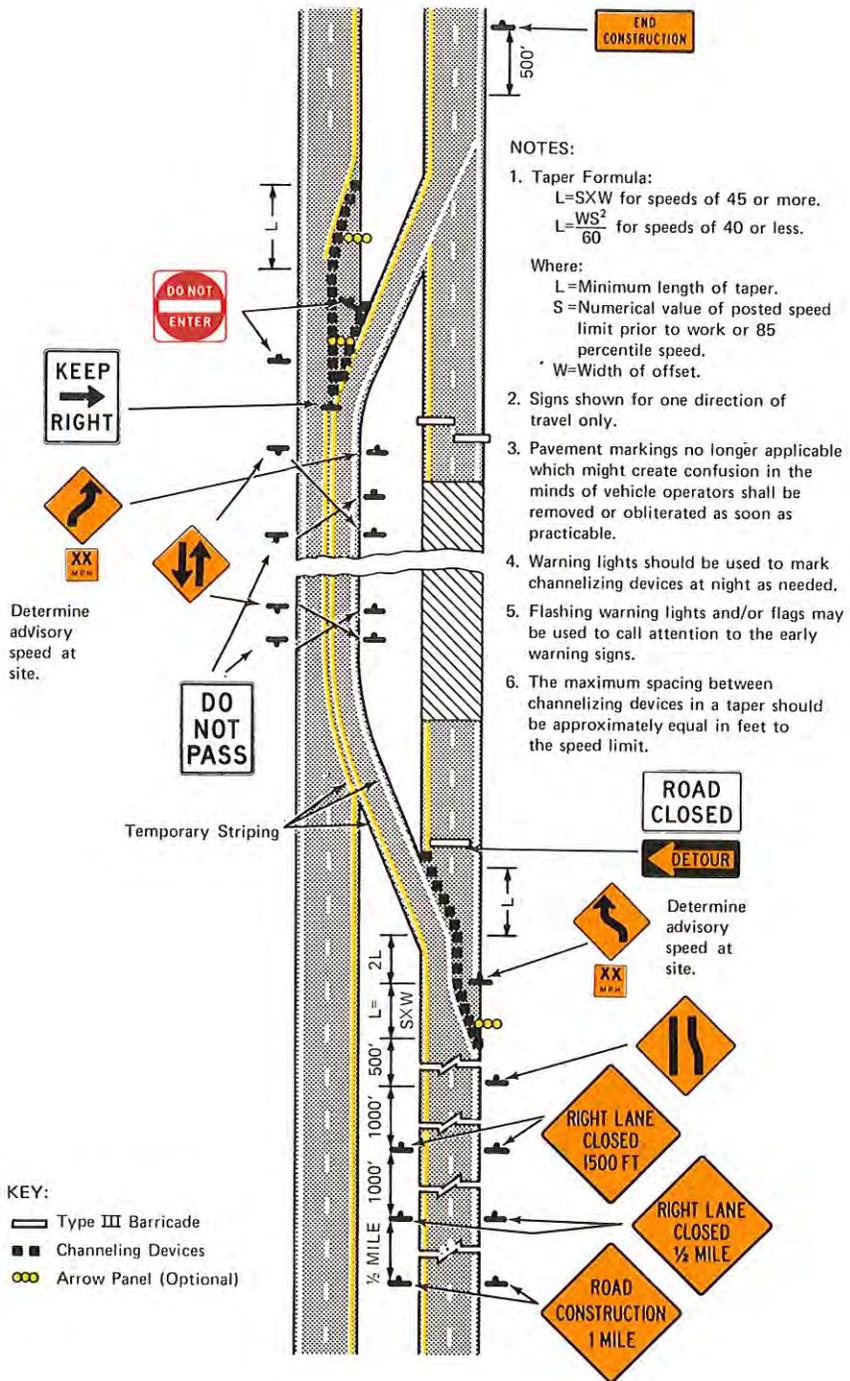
Typical application—4-lane divided roadway where one roadway is closed.
